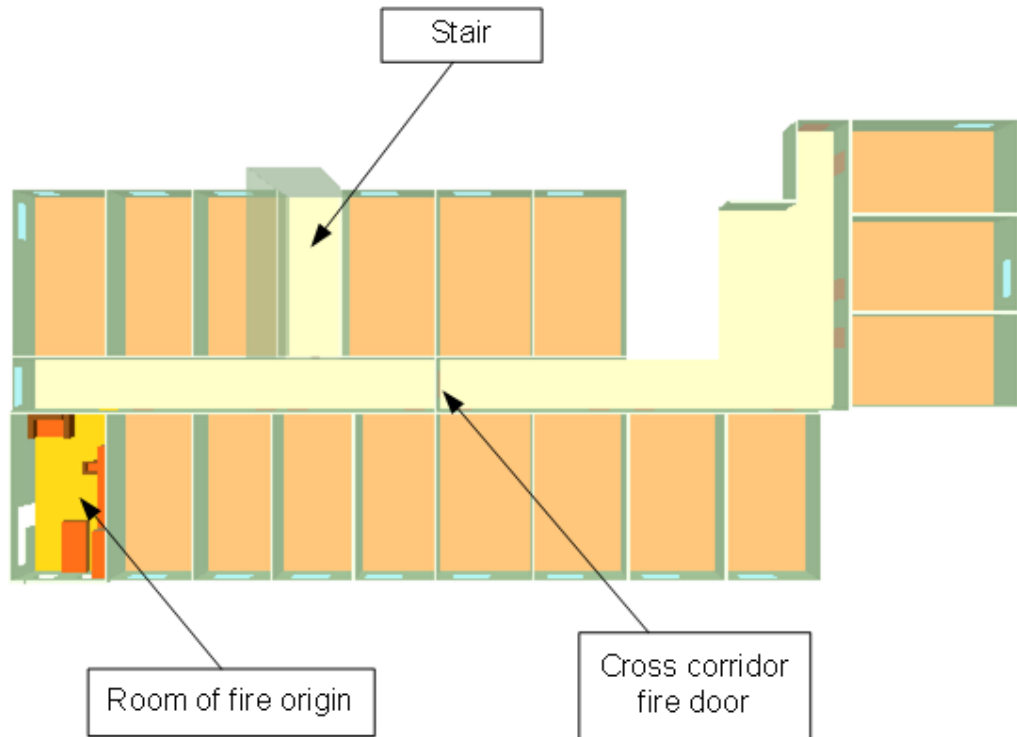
General layout of the model (for both sprinklered and unsprinklered cases)
